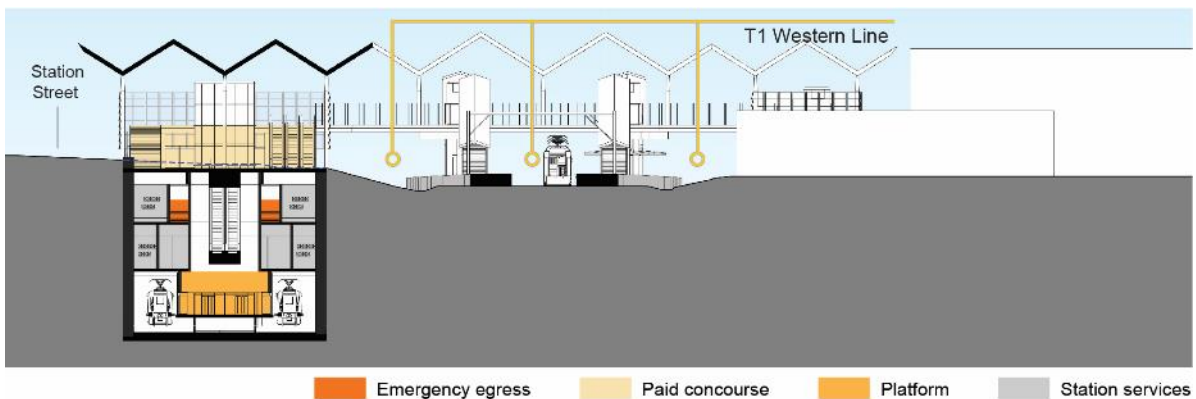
Cross section of St Marys station box and aerial concourse (facing west), showing depth of excavation for the station box.
